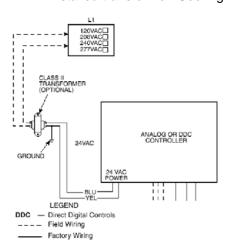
Wiring of Optional Factory-Mounted Transformer
